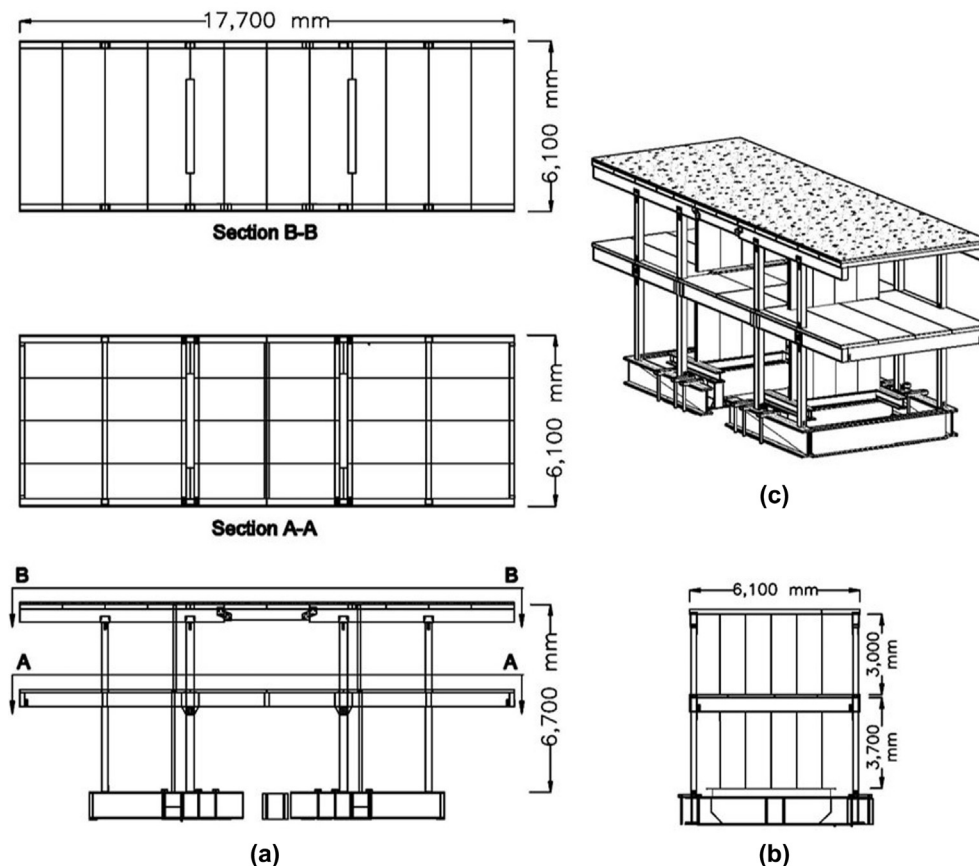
Test Building: (a) Front elevation and plan view; (b) Side elevation view; (c) Isometric view.
